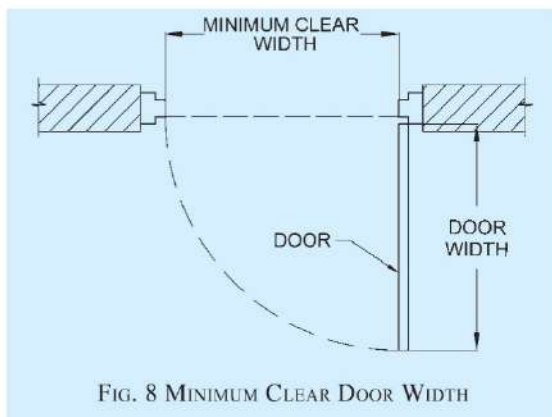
MINIMUM CLEAR DOOR WIDTH
